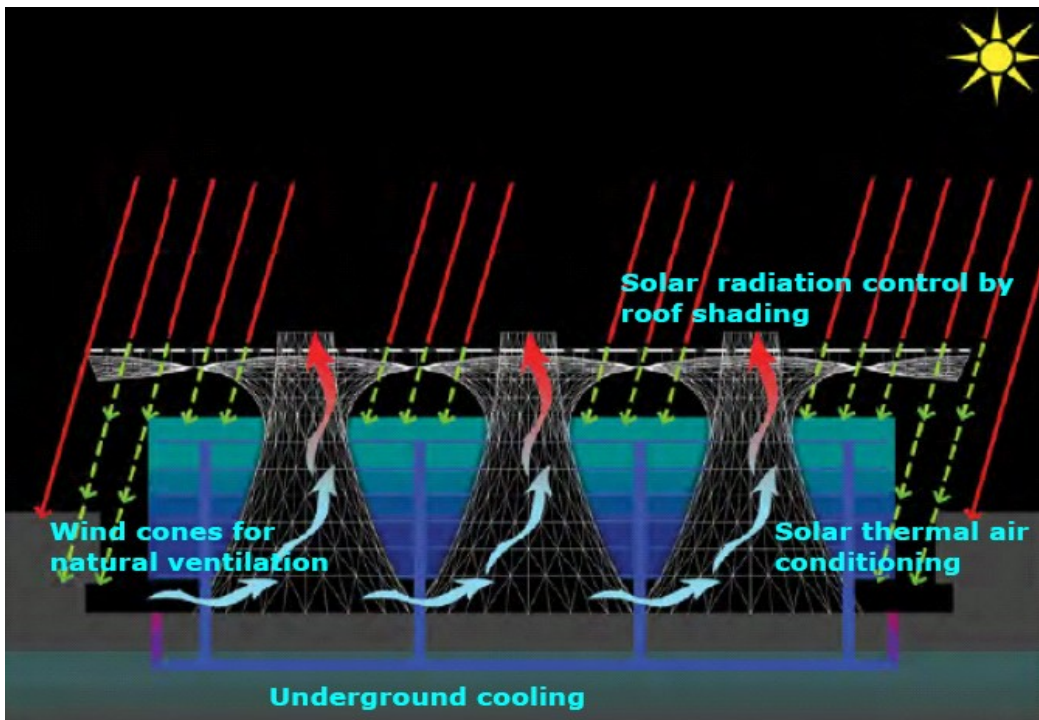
Schematic for passive cooling and ventilation strategies (wind cones ventilation, solar thermal air conditioning, earth cooling, and solar shading)⁸⁹
